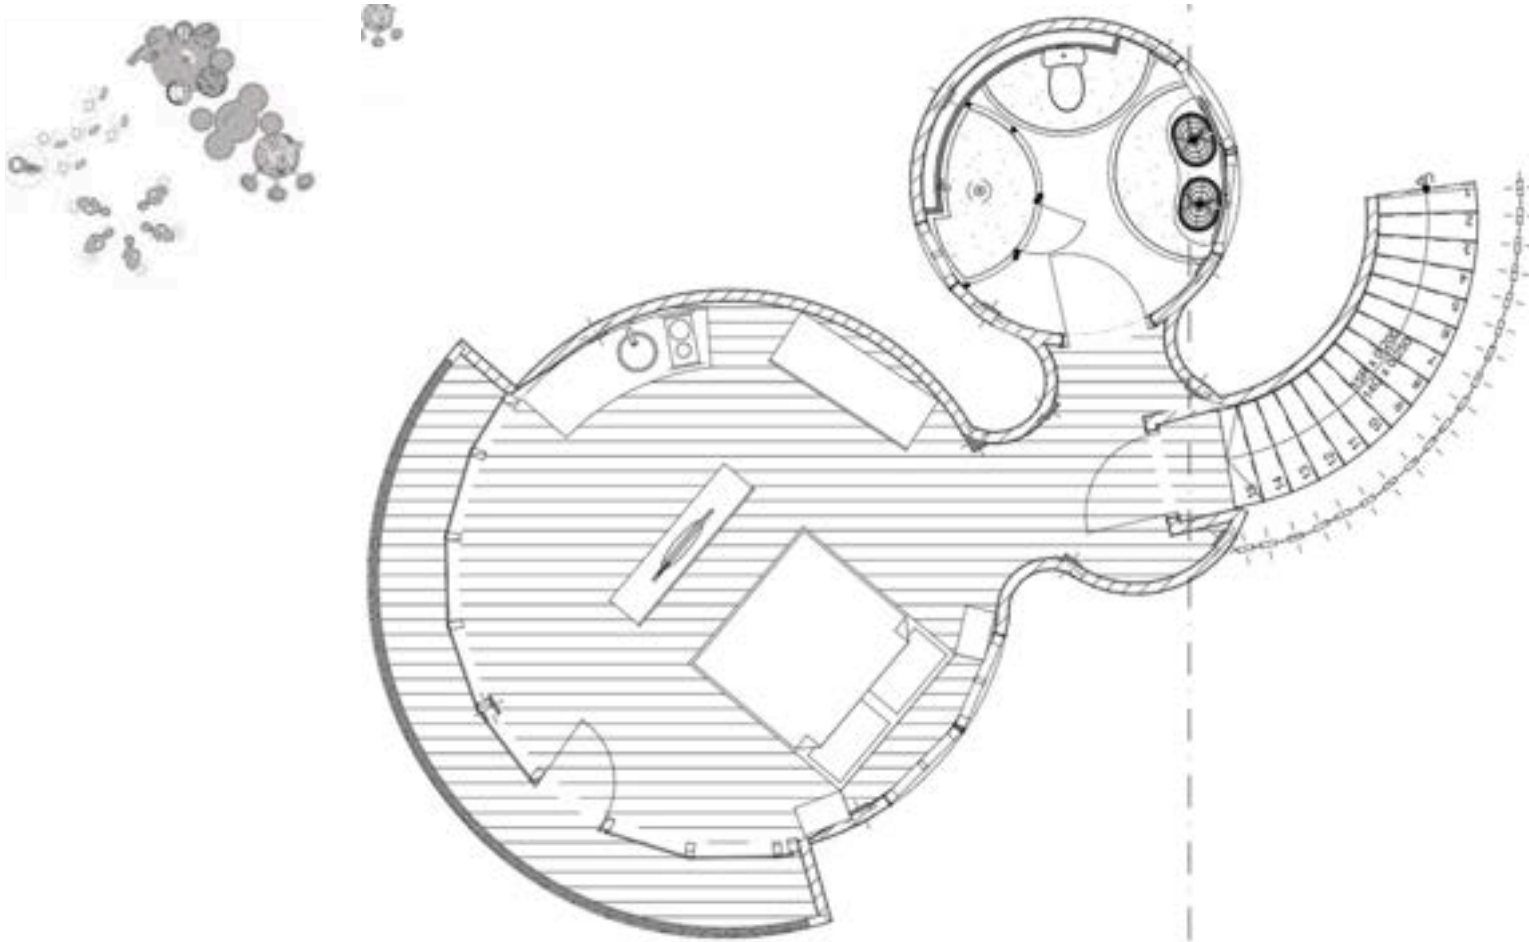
Saras Guest Room 1st Floor Plan
